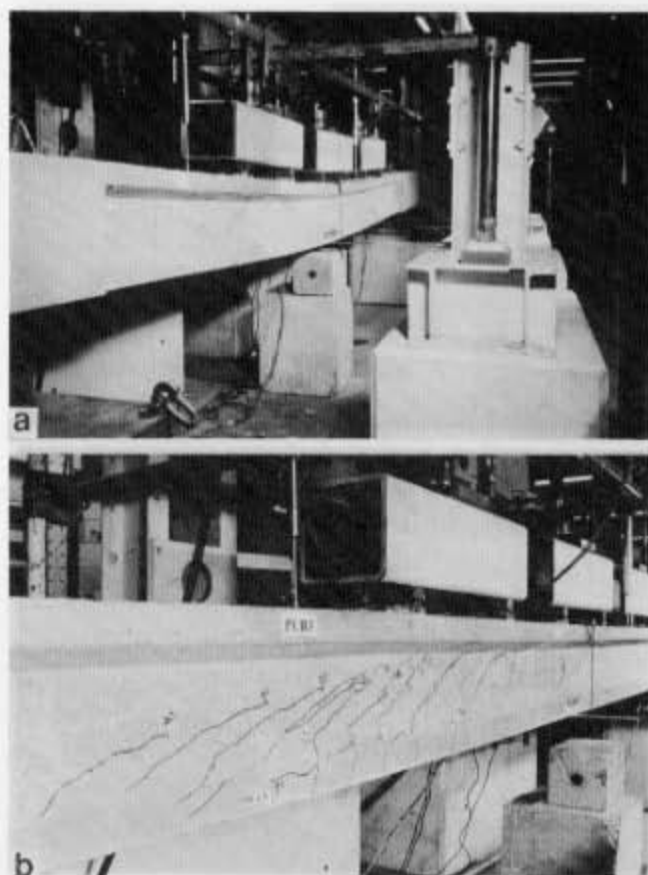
Crack patterns just before failure for (a) PCB2 (105 kN) and (b) PCB3 (90 kN)
